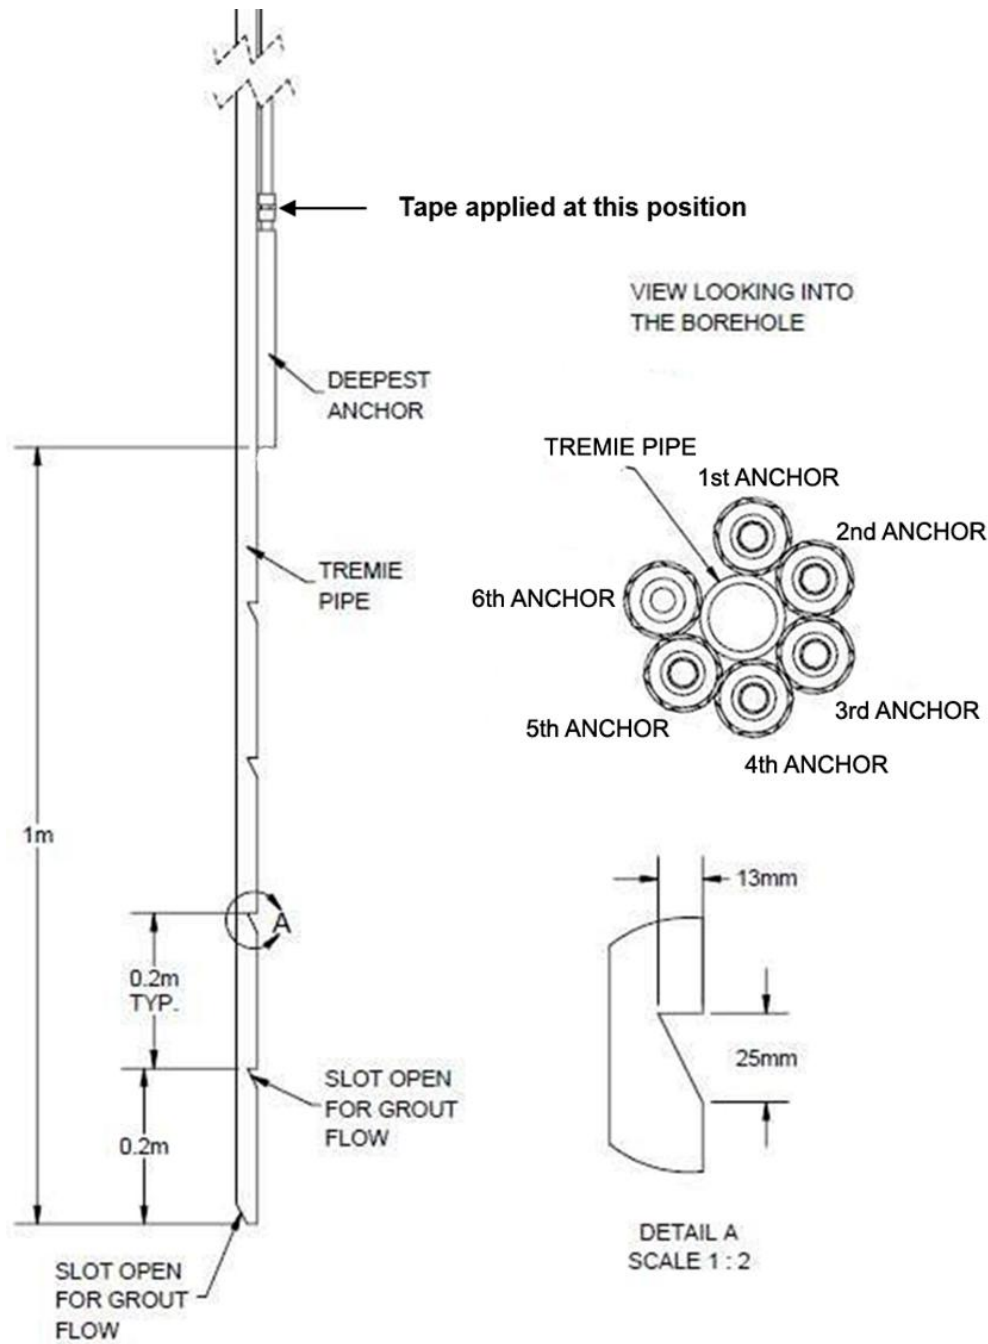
Slotted Openings on Tremie Pipe and Anchor Orientation
